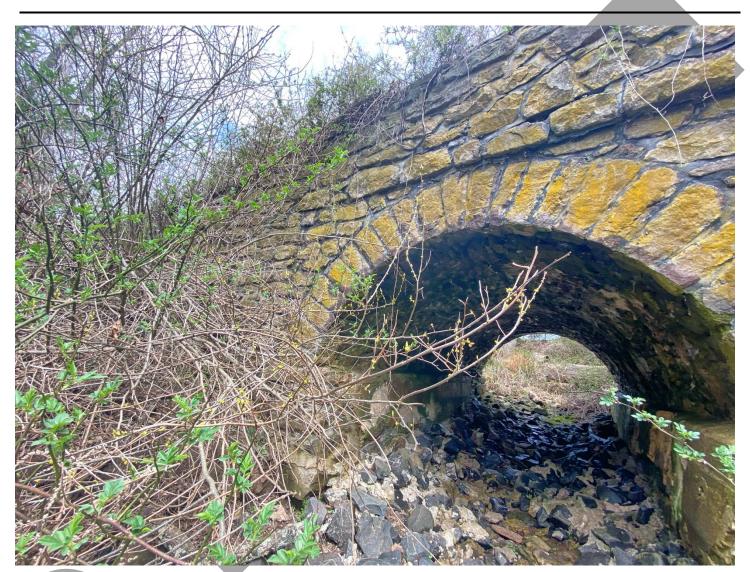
Southwest (downstream) side of the bridge, view facing north showing the southwest wingwall
